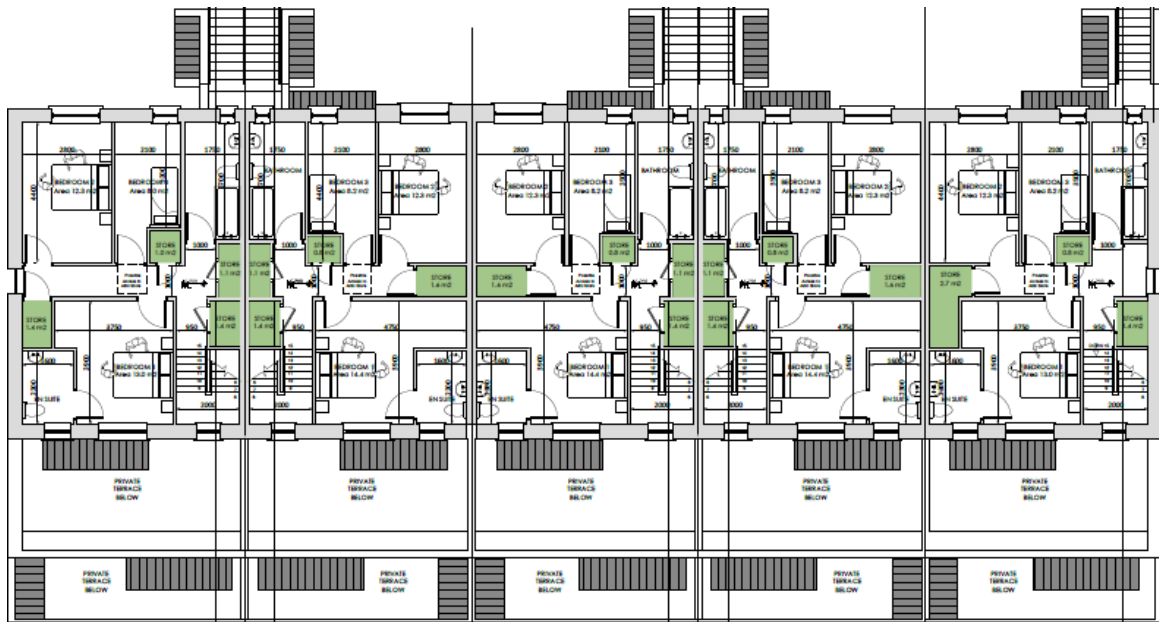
Proposed second floor plan of Duplex Apartment Block G.
